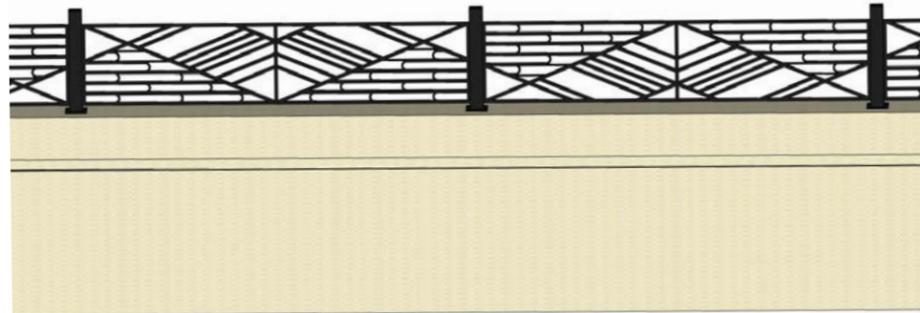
Proposed Protective Barrier with Decorative Railing
